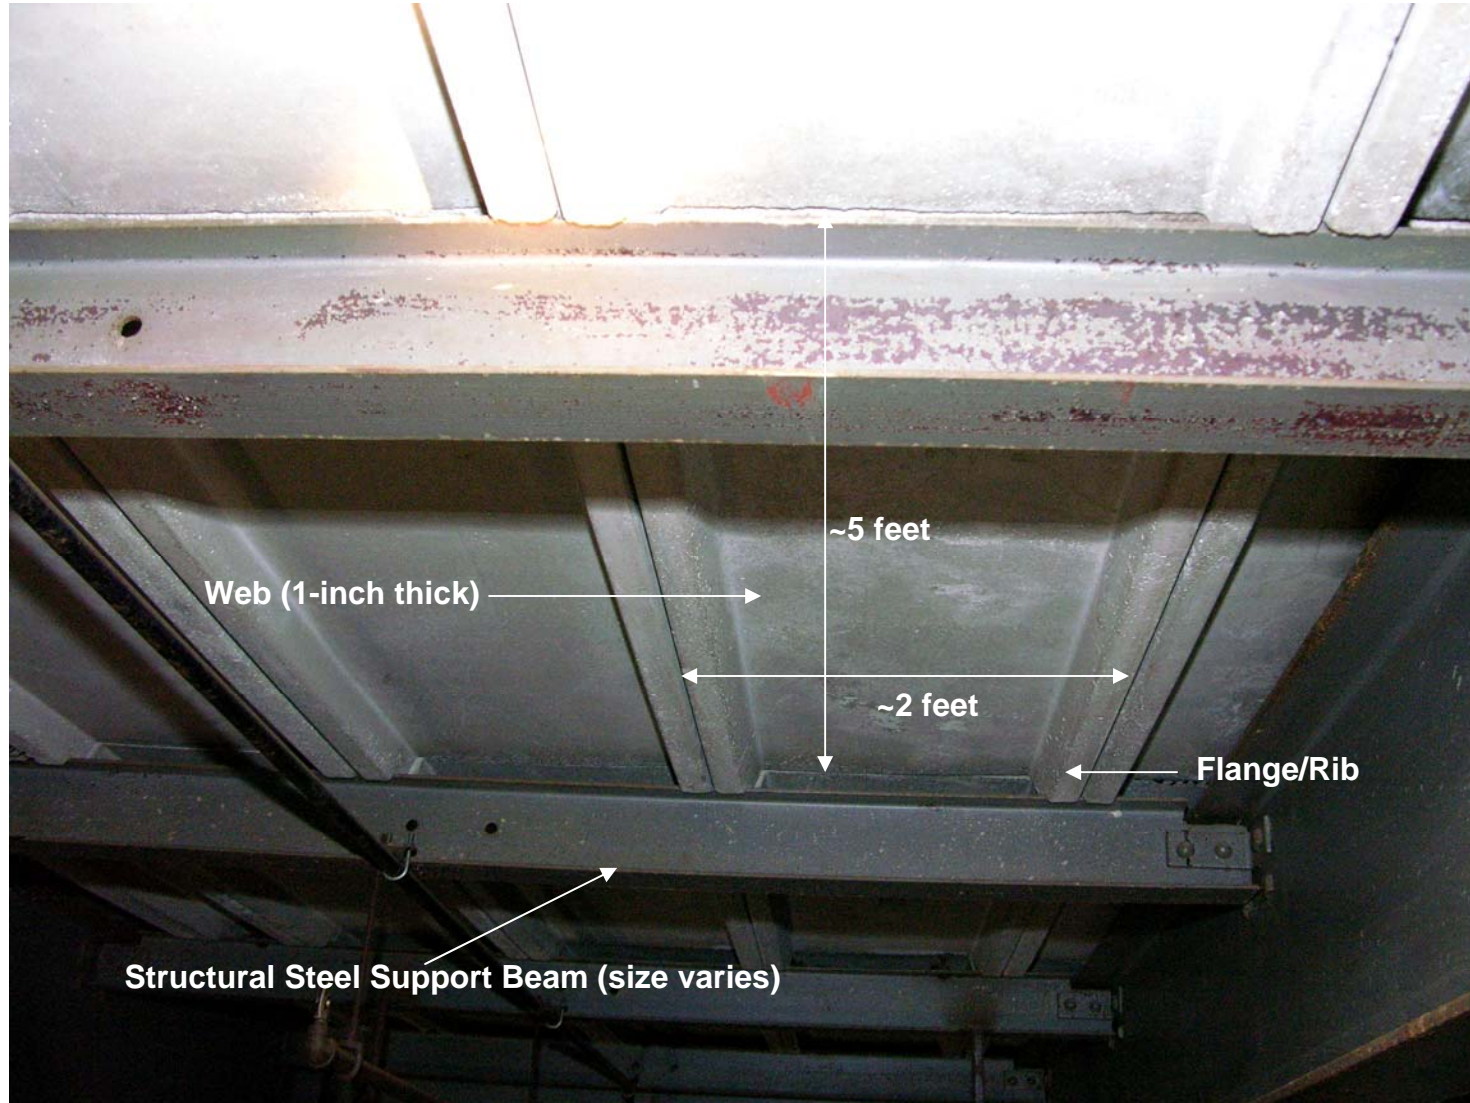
Underside view of the operating floor concrete panel layout/installation
